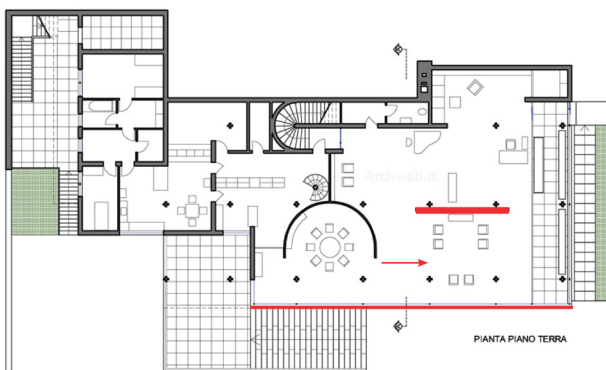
The planes highlighted in red indicate the onyx wall (left) and the glass wall (right) (20th Century Architecture, n.d.). Plan: (Archweb, n.d.)
